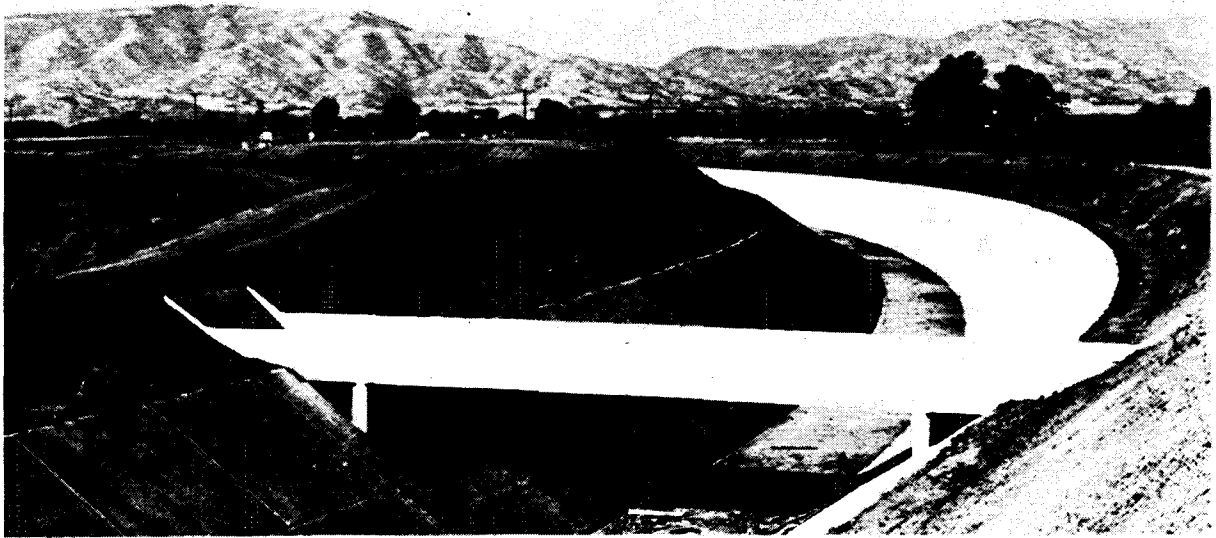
Rectangular concrete overchute. SO-2217-R2.
